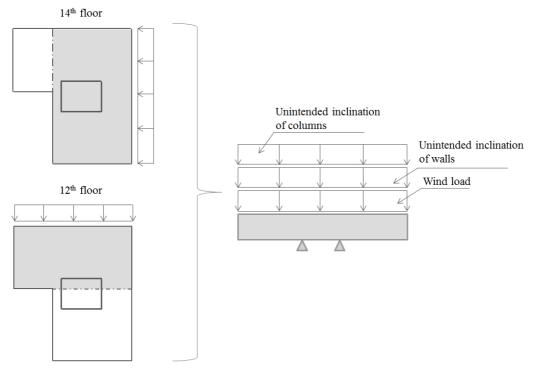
Model of the floors in the concept as a deep beam supported by the concrete core with two supports. Two cantilever parts.
